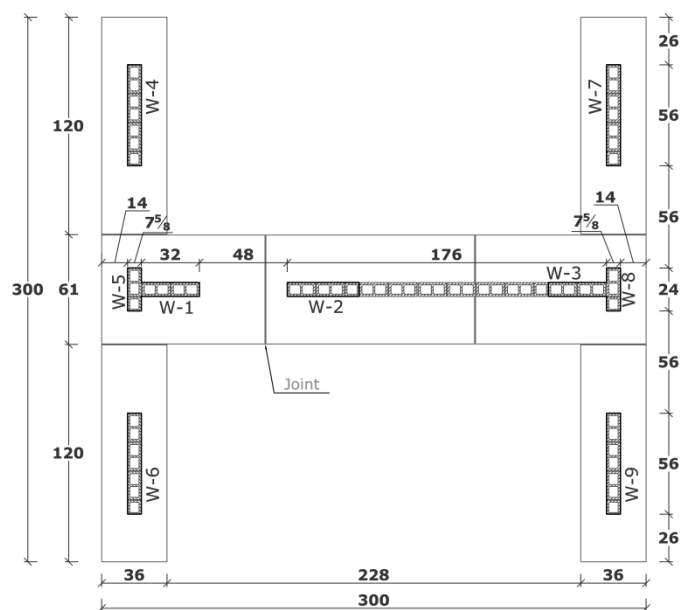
Foundation plan and wall layout. All the dimensions are in inches (1 in. = 25.4 mm)
